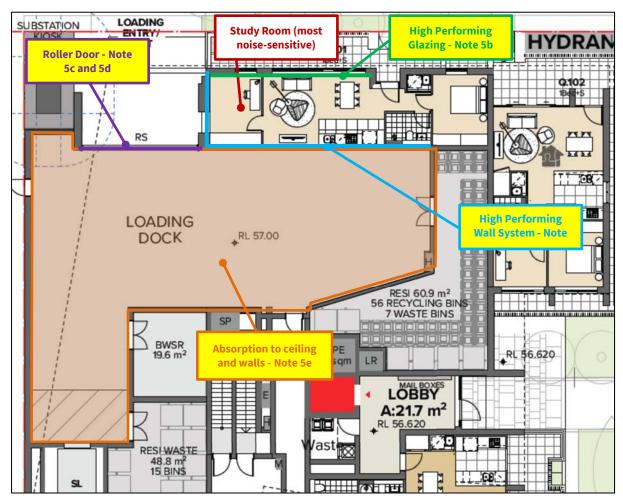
Loading dock was on Level 1 of Building 2D (image source - architectural drawings)
